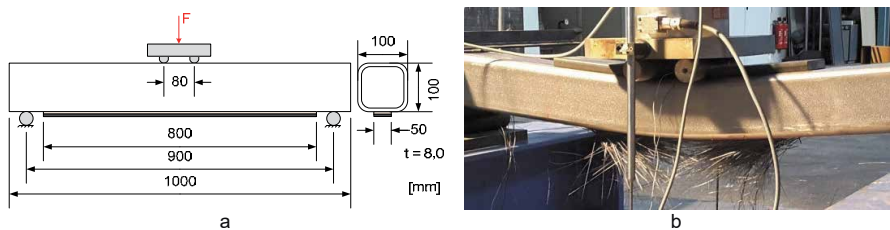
a) Test setup: hybrid reinforcement made of CFRP laminate; failure of CFRP laminate during testing.
